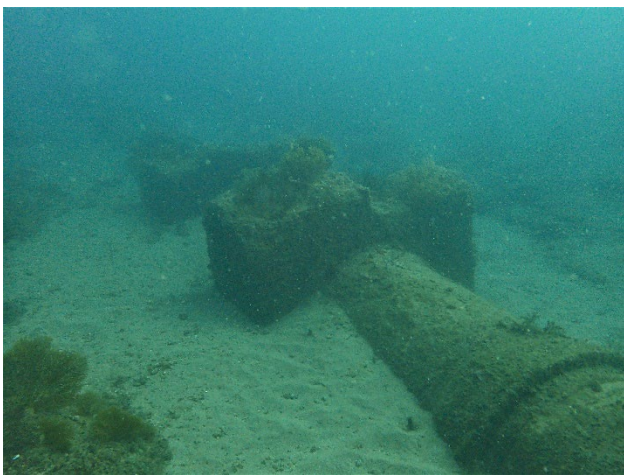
Diffuser port looking through to other side of the pipe section on the 60-inch outfall.
